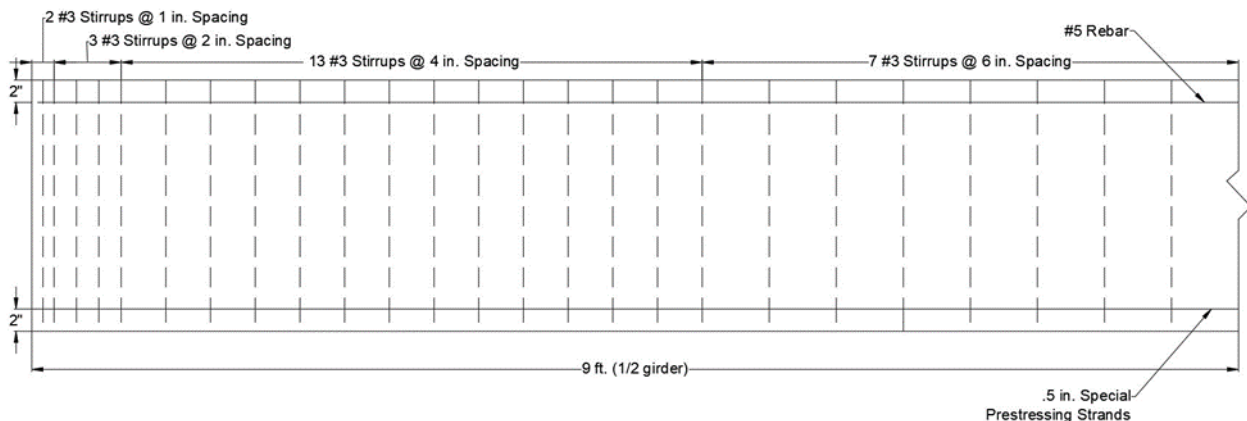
Prestressed beam specimen elevation view showing shear reinforcement
